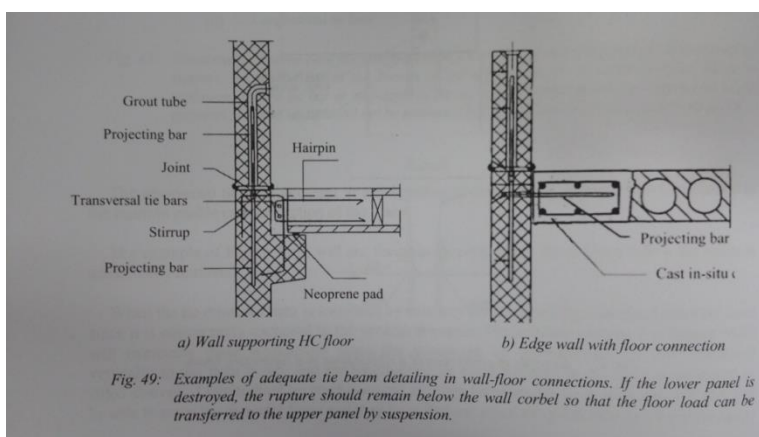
Examples of adequate tie beam detailing in wall-floor connections. If the lower panel is destroyed, the rupture should remain below the wall corbel so that the floor load can be transferred to the upper panel by suspension.
